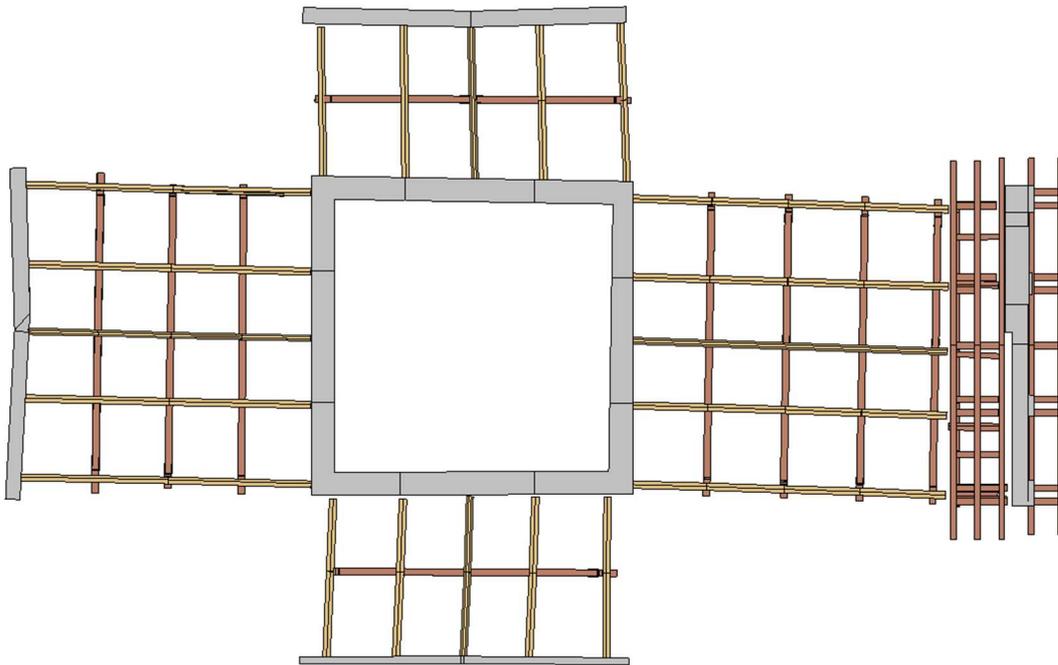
Modelling all of the Frames, Purlins, and Ridge Beams Including the Old Frame on the Right
